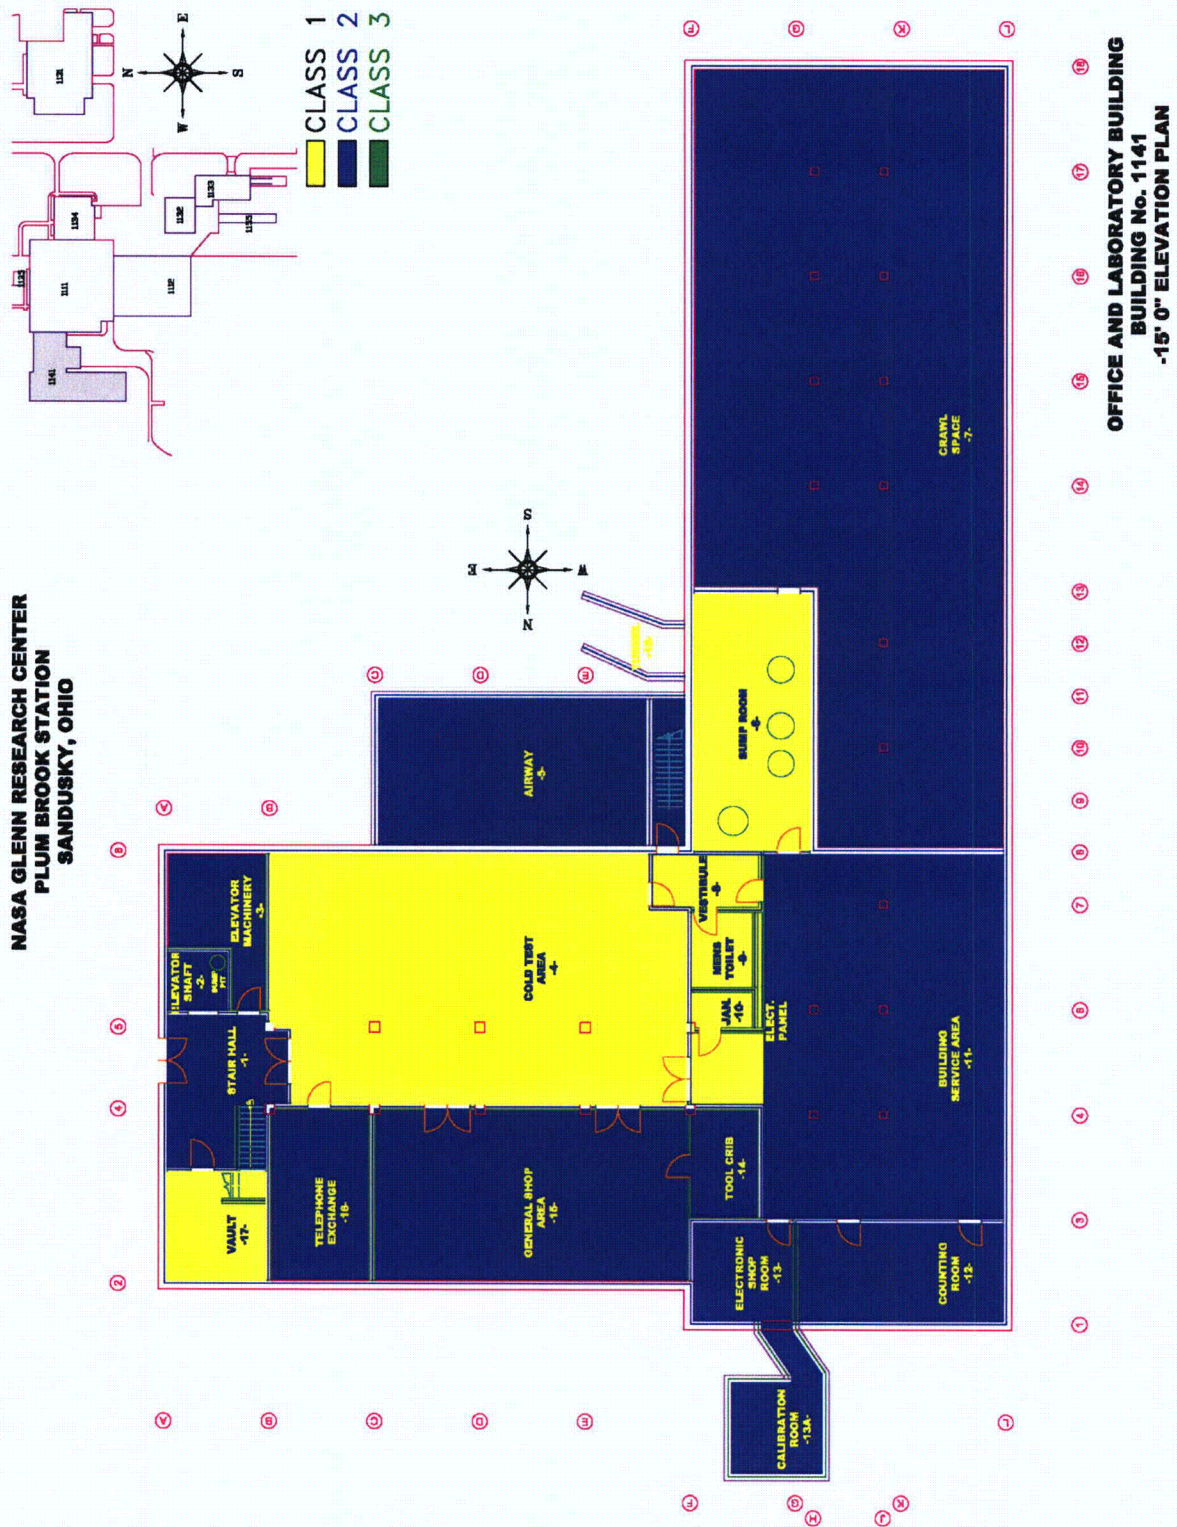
Reactor Office and Laboratory Building Basement Elevation
